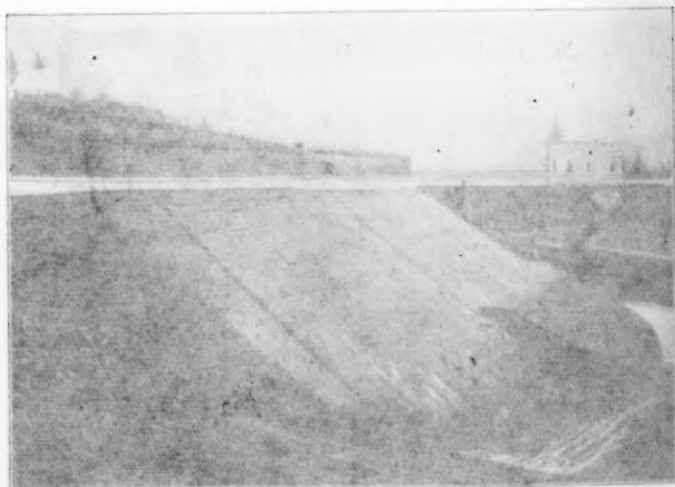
RESERVOIR NO. 2: CRACKS IN BUTTRESS AND IN FAHAPET, SEPTEMBER 28TH, 1897.
